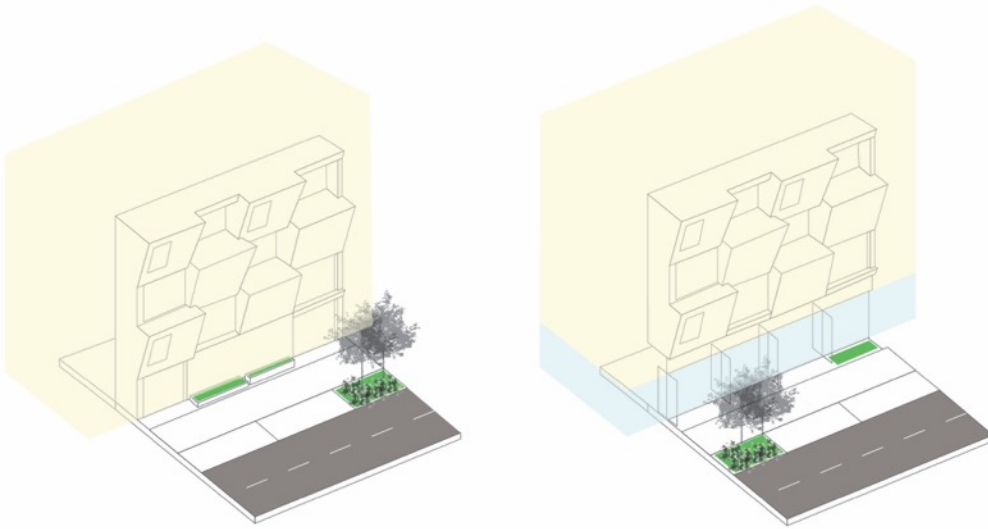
Narrow Street Edge Conditions, Residential or Mixed Use (Author)
